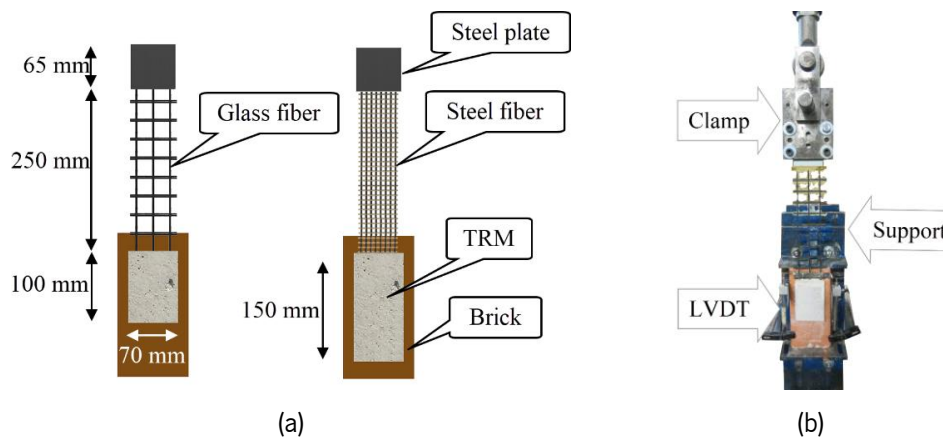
Single-lap shear test specimens: (a) specimen's configurations; (b) test setup.
